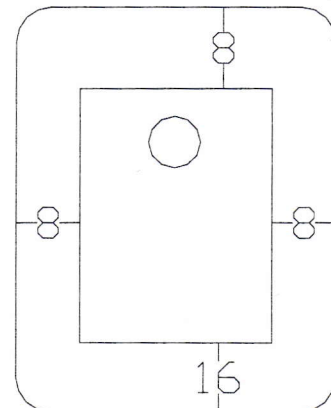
CLEARANCE TO COMBUSTIBLES
